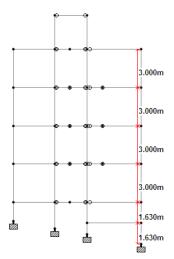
Elevation of residential building on 10 deg. Slope
